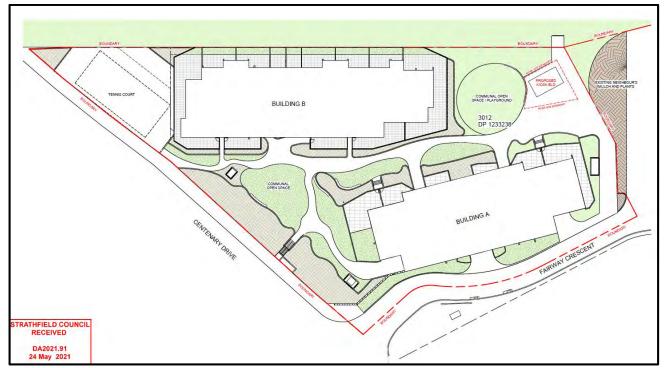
Site Plan showing residential flat buildings and common areas within subject site
